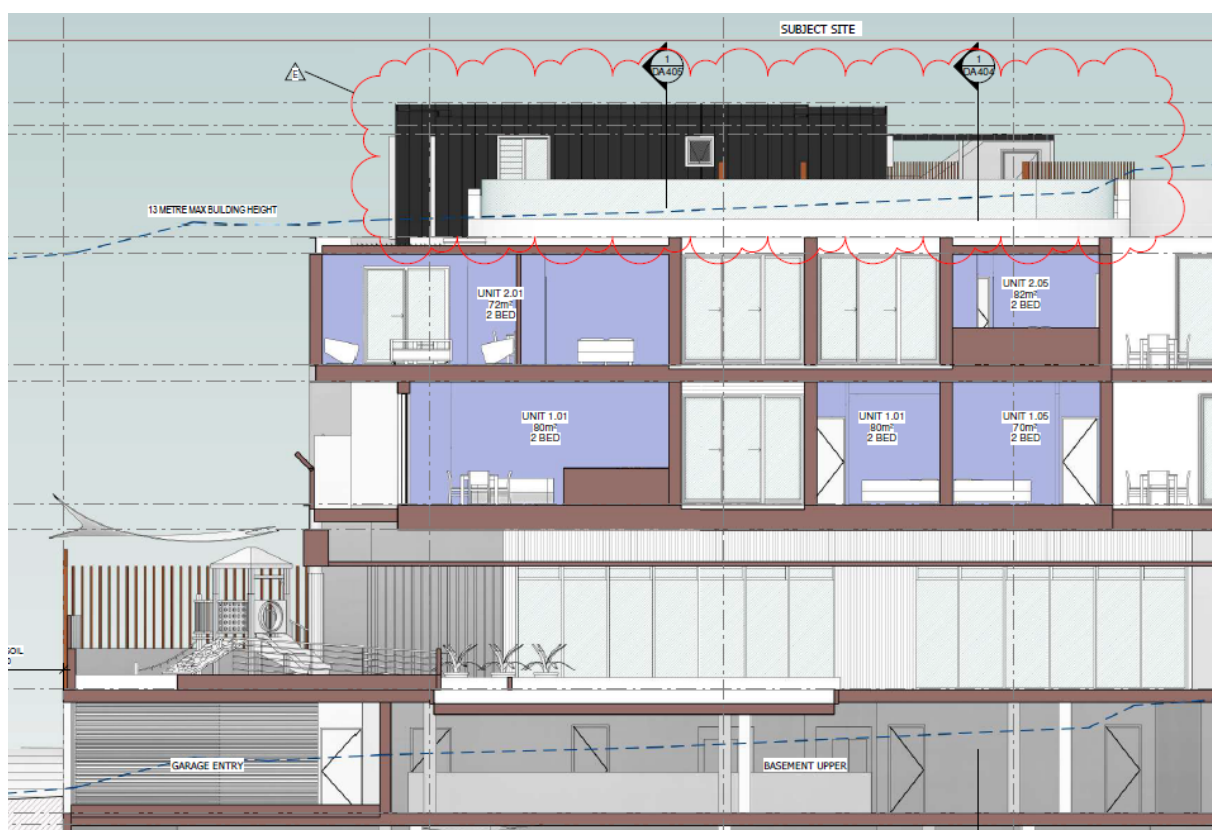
Architectural cross section. The upper blue dotted line shows the 13m Height of buildings development standard height plane.
